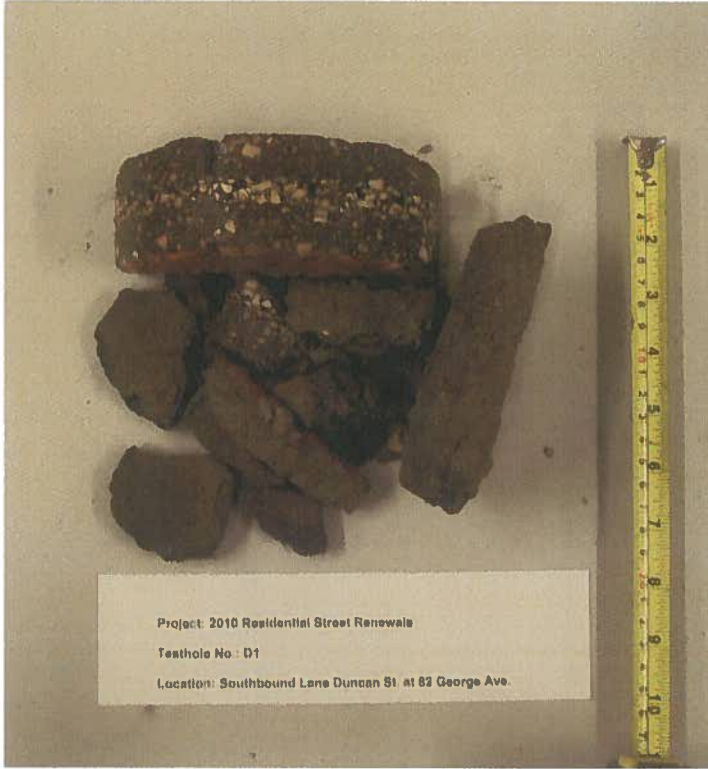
Test Hole D1: Duncan St. Southbound Lane, 10 m S of S sidewalk at George Ave, 1.9m E of W curb
